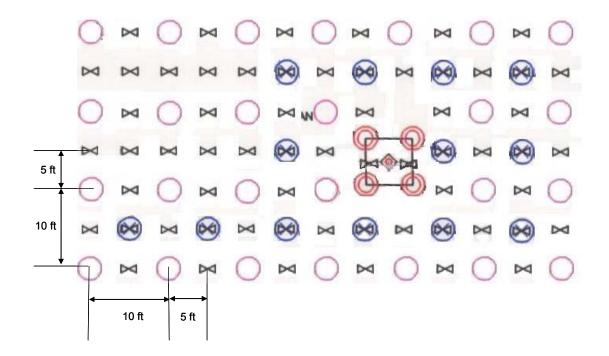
Sample stone column and wick drain layout for the San Pedro Home Depot case history. Primary stone columns are shown as empty circles, wick drains as hourglasses, secondary columns as circles with an x inside, and stone columns supporting building columns as double lined circles.
